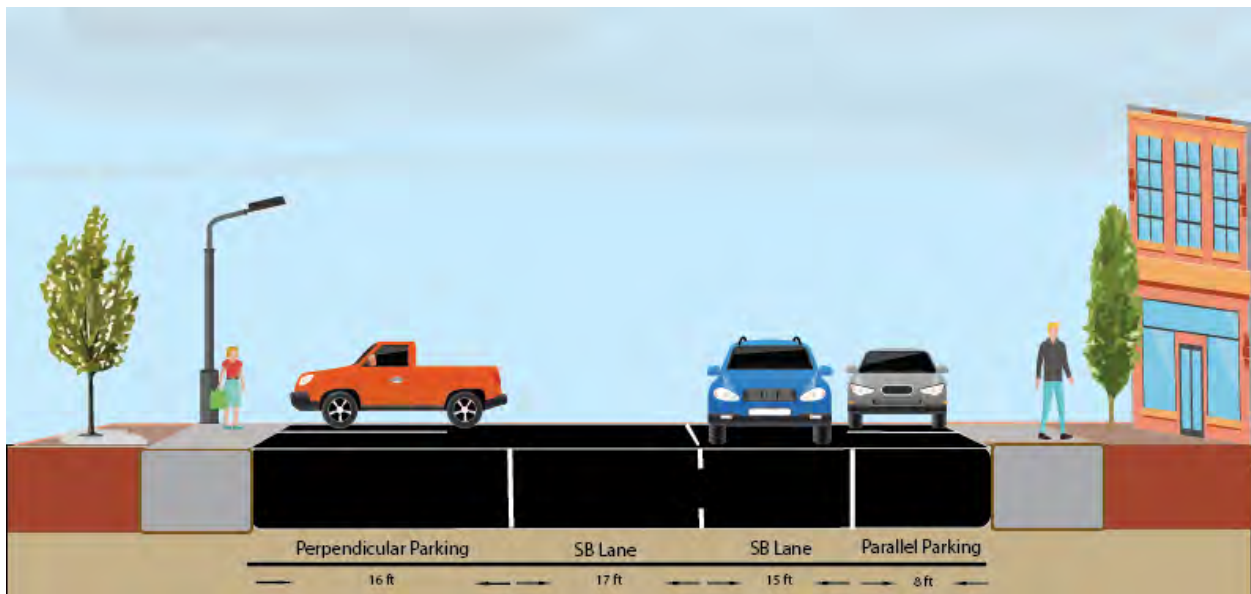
WOLCOTT STREET TYPICAL SECTION
